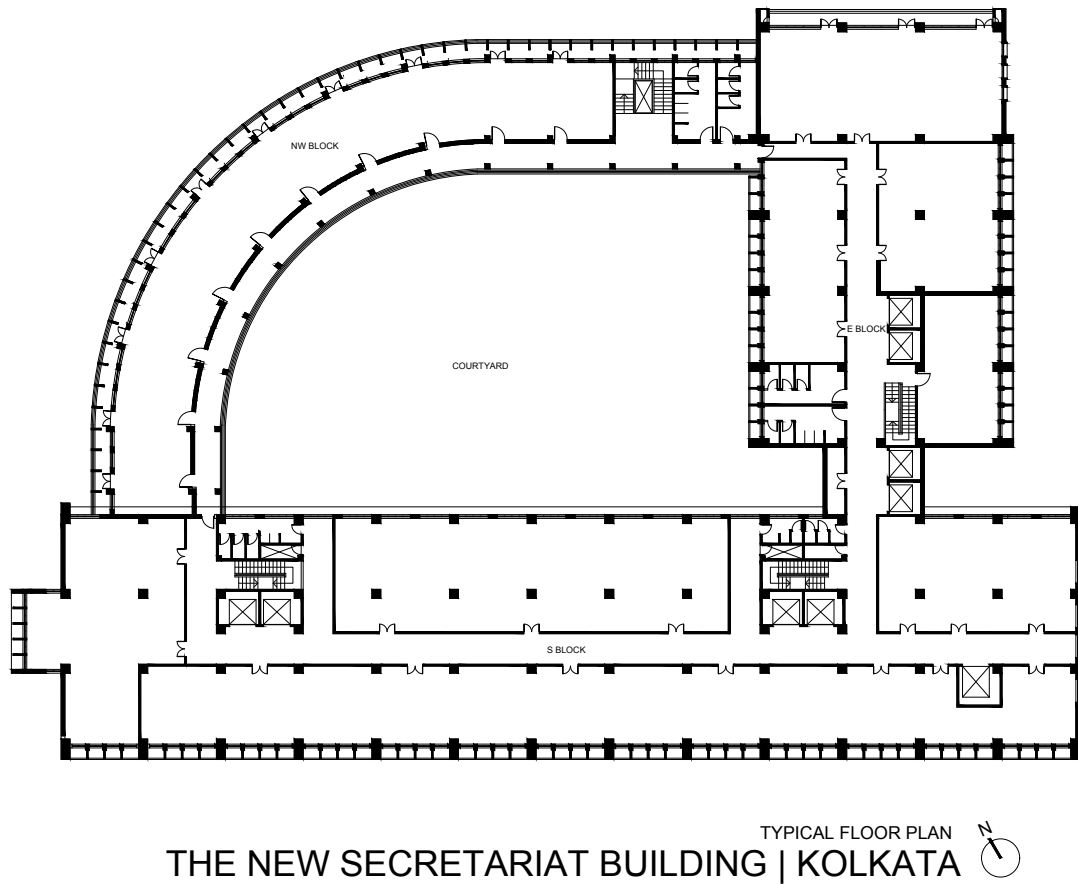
Plan of the New Secretariat Building, Calcutta. Source: Drawn by author.
